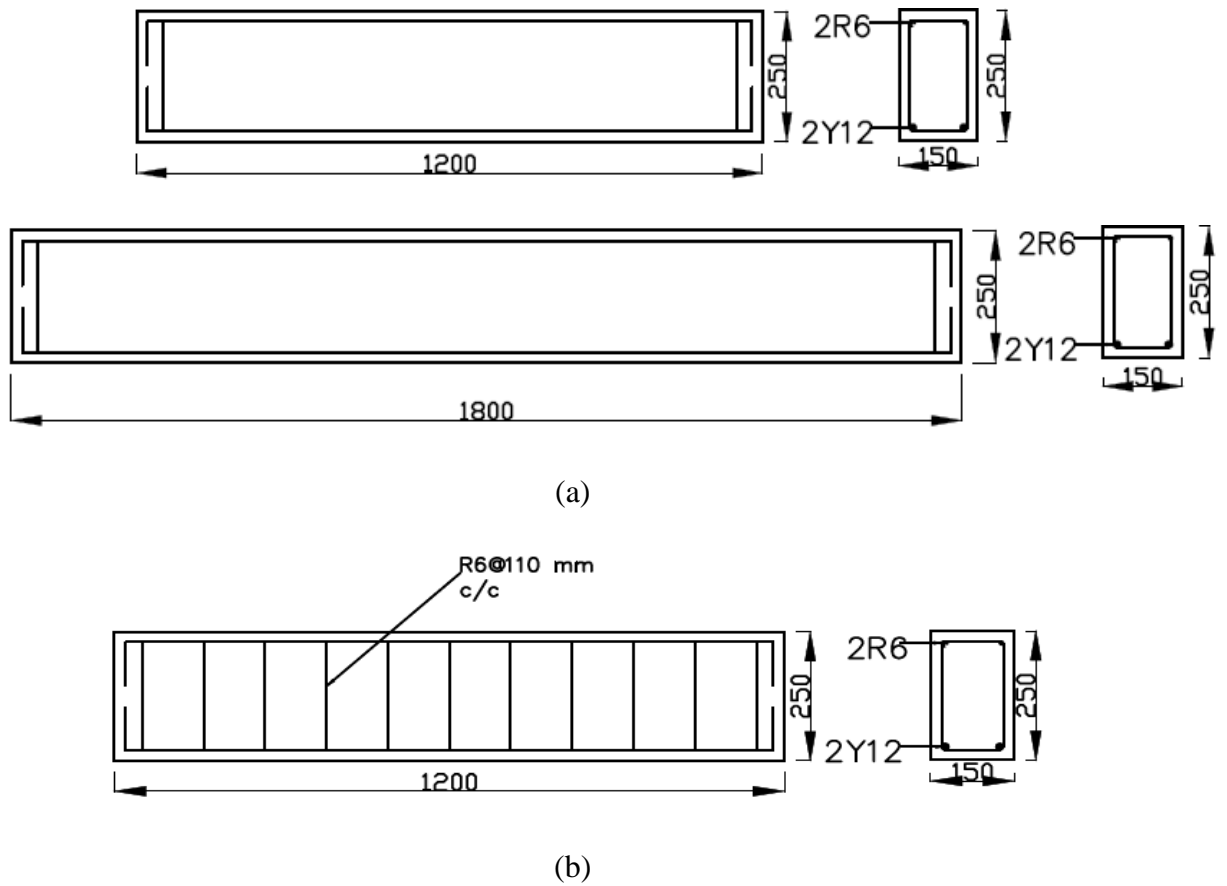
Beam geometry (a) with (b) without reinforcement
